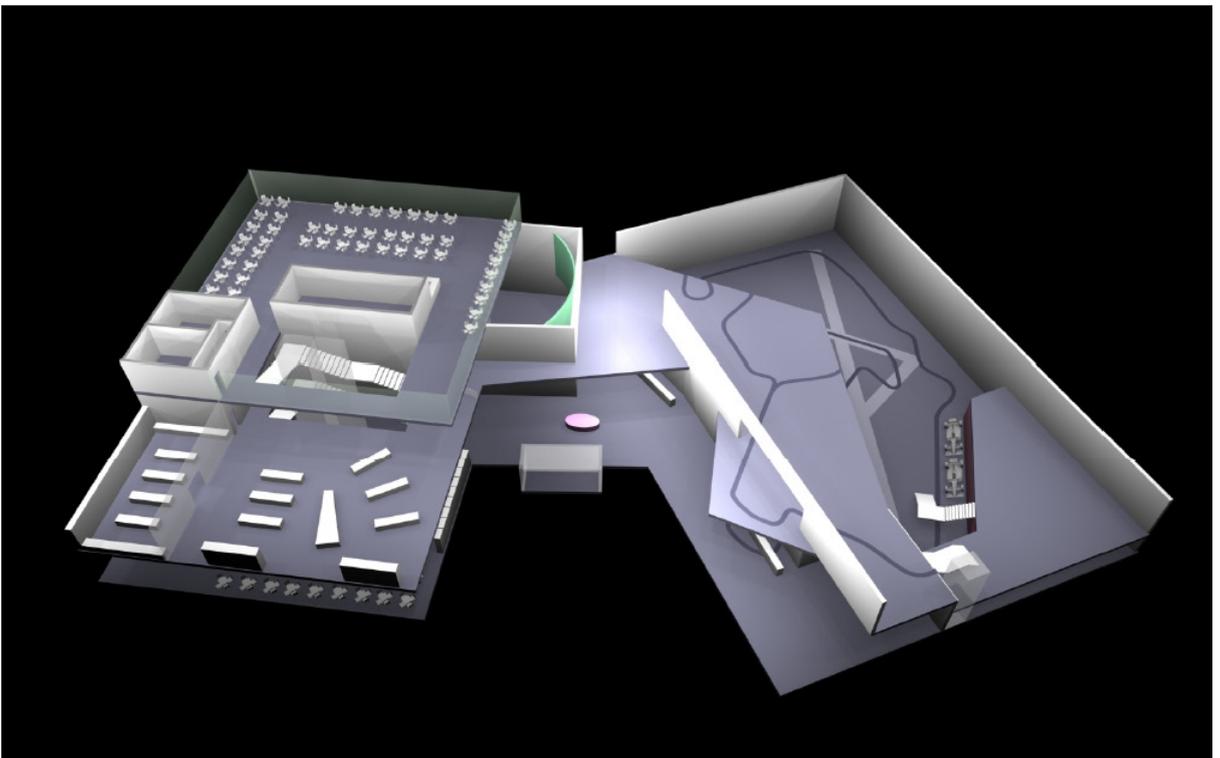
#2 Location, Concept Design Building Layout Proposal, 25th June 2014 (David, 2014, p.7)
